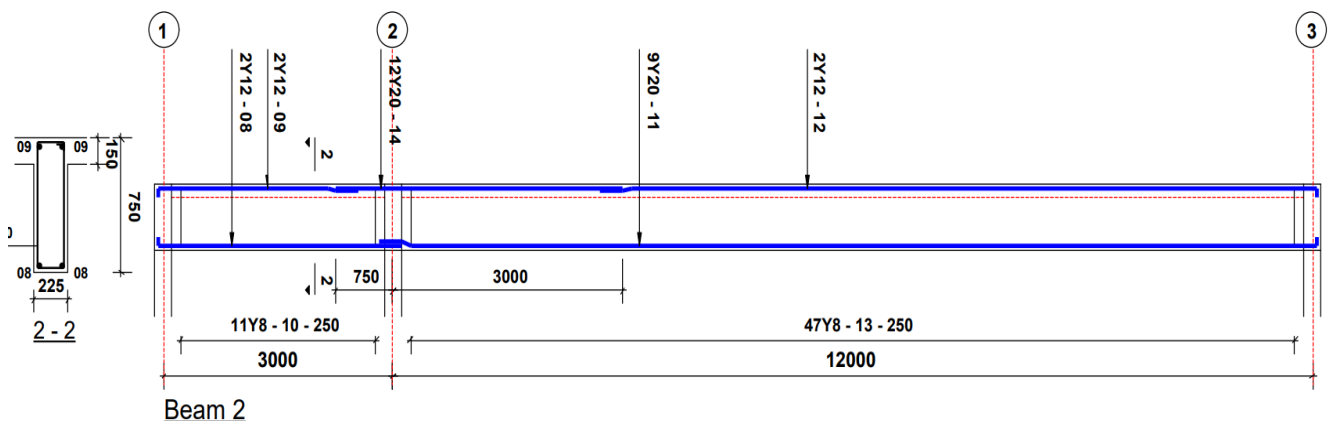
detailing of the beam-2 Showing both longitudinal reinforcements and shear reinforcements
